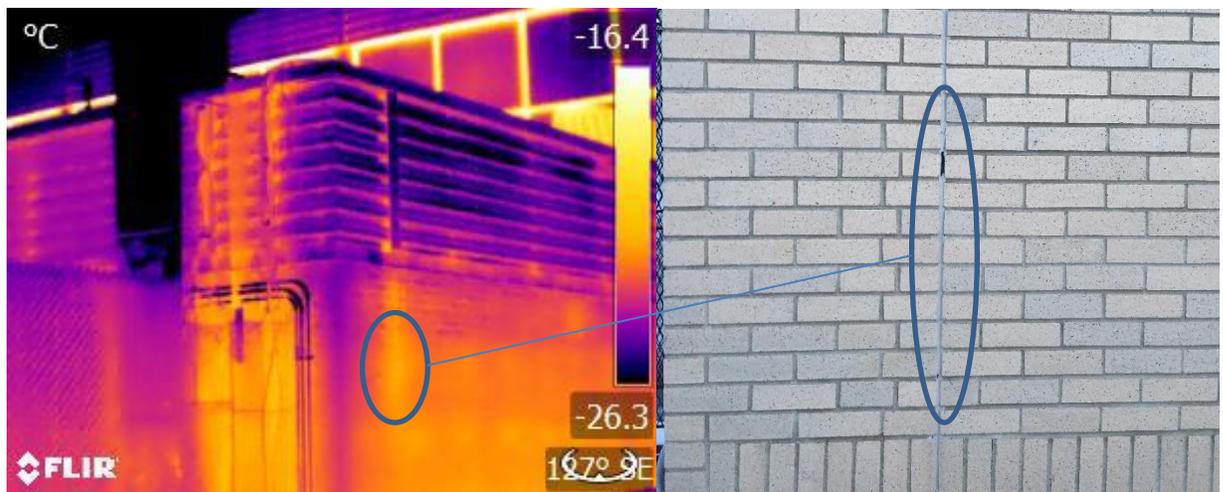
Air leakage at masonry control joint at West elevation (refer to Photograph #17). Air leakage at masonry control joints is a result of discontinuous and debonded sealant at the joints. The sealant at many of the control joints is debonded or discontinuous. Warm, moist air from within the pool building leaking through the control joints will cause condensation when in contact with cold outdoor air or colder building materials. The condensation created can cause deterioration of the masonry over the long term.
